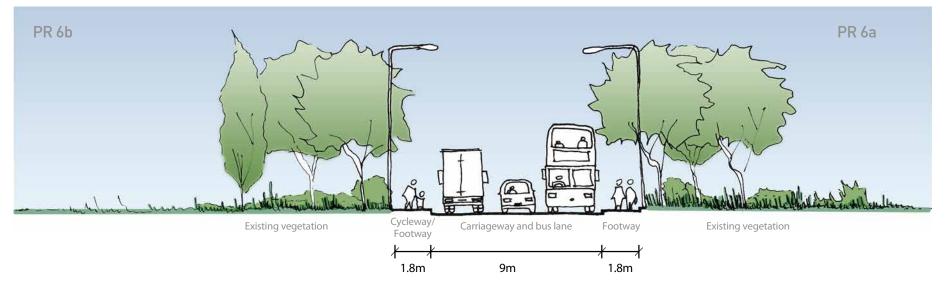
A-A – existing Oxford Road cross section (refer to Fig. 18 for section location)
